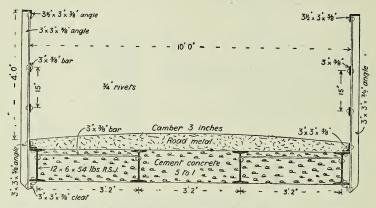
Cross Section of Bridge, 10 Ft. wide, to carry about 6 Tons.
